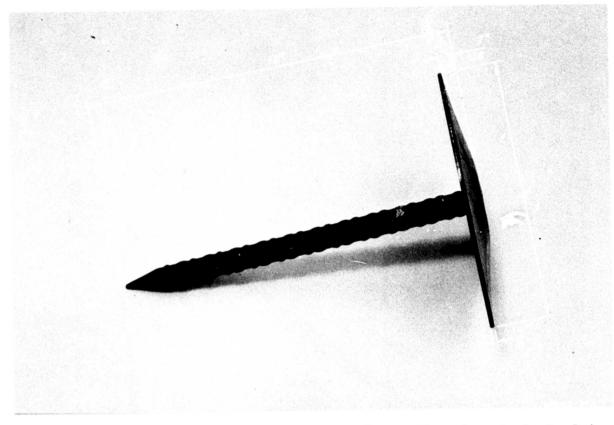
Steel anchor consisting of 8-in.-diam shaped steel plate welded to 3/4-in.-diam reinforcing rod.
